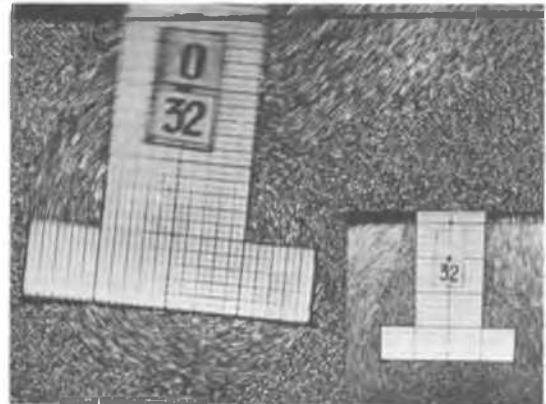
The observed mode of failure for an embedded rigid foundation loaded by an overturning moment.
